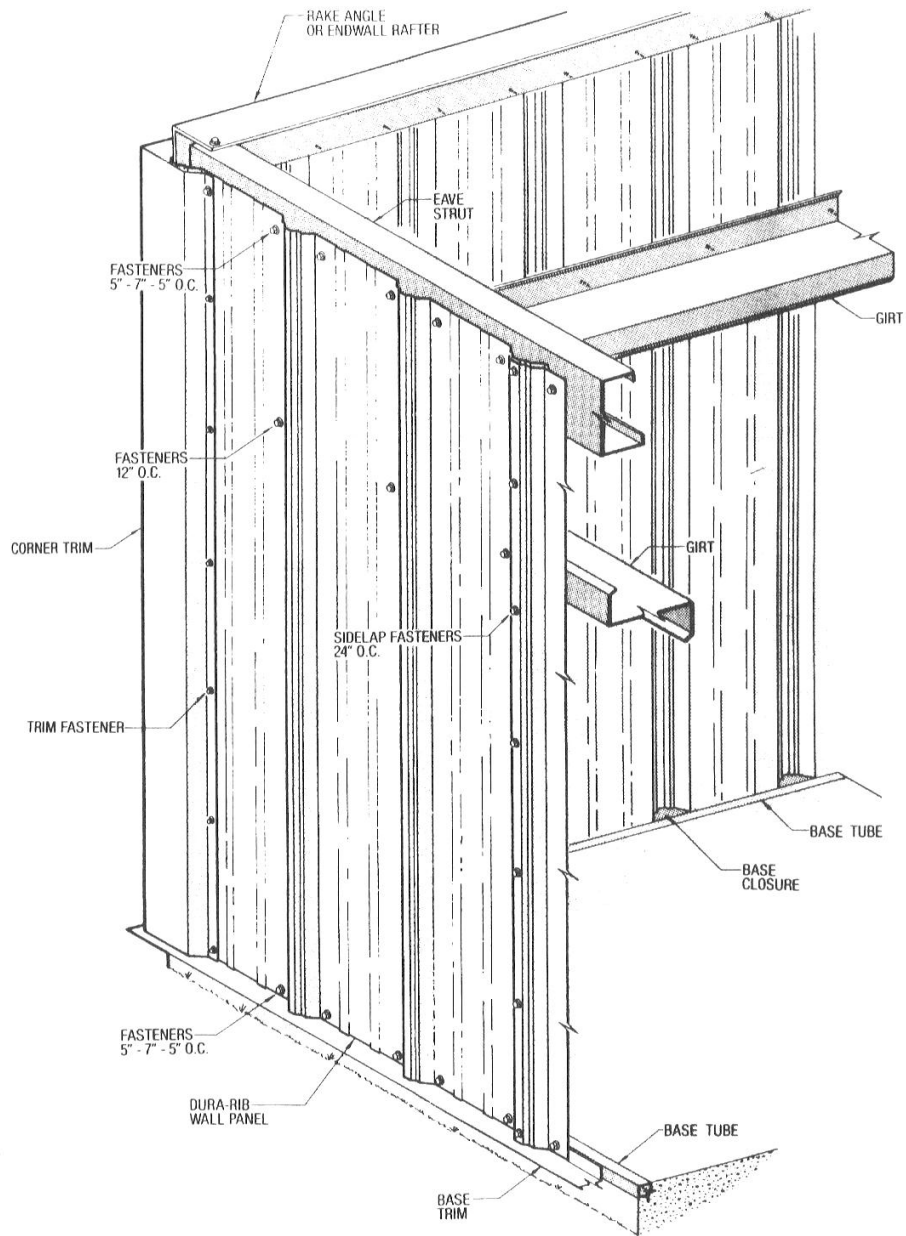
Example of a Metal Wall System with Exposed Fasteners (Newman, 1997).
